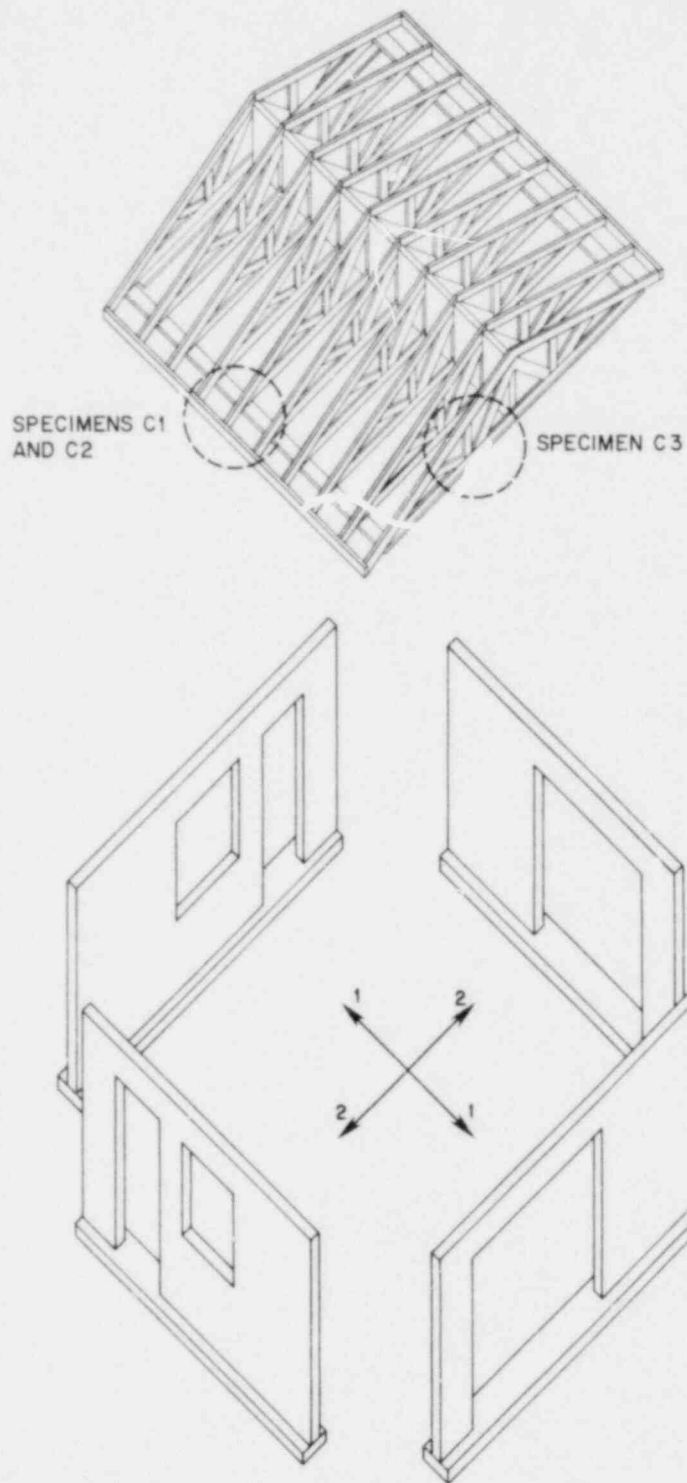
ROOF STRUCTURE FOR A MASONRY HOUSE
